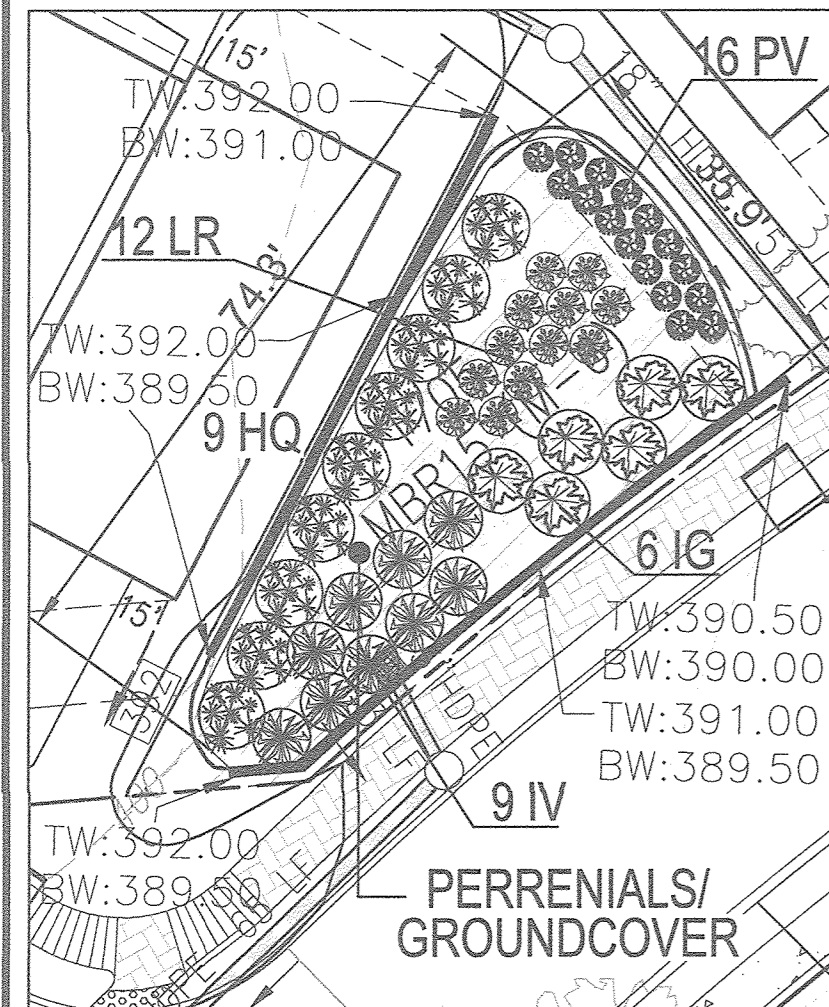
DETAILED BIO AND PLANTING PLAN (SWM #12)
